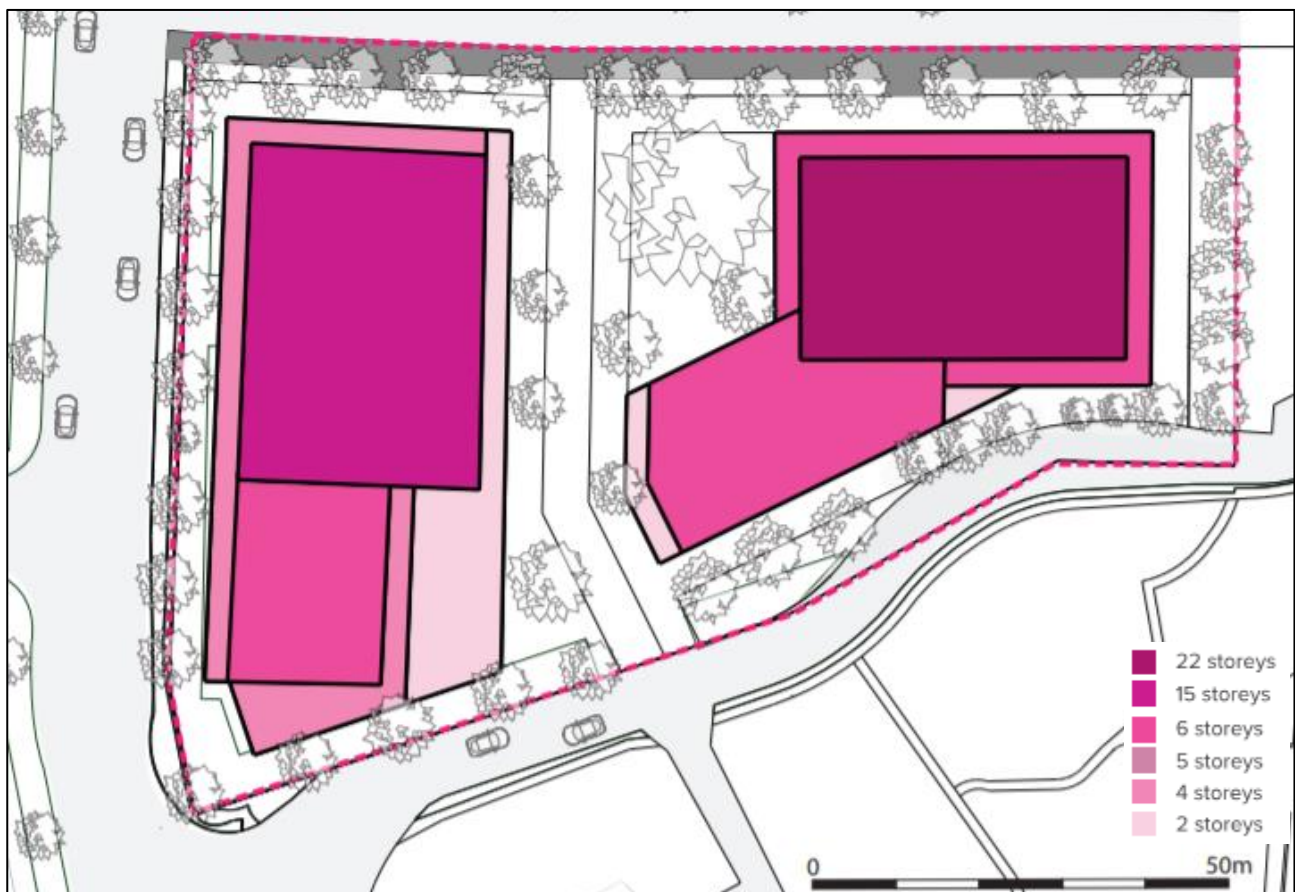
Base Case Height of Buildings for 93 Bridge Road, Westmead (Roberts Day 2020)
